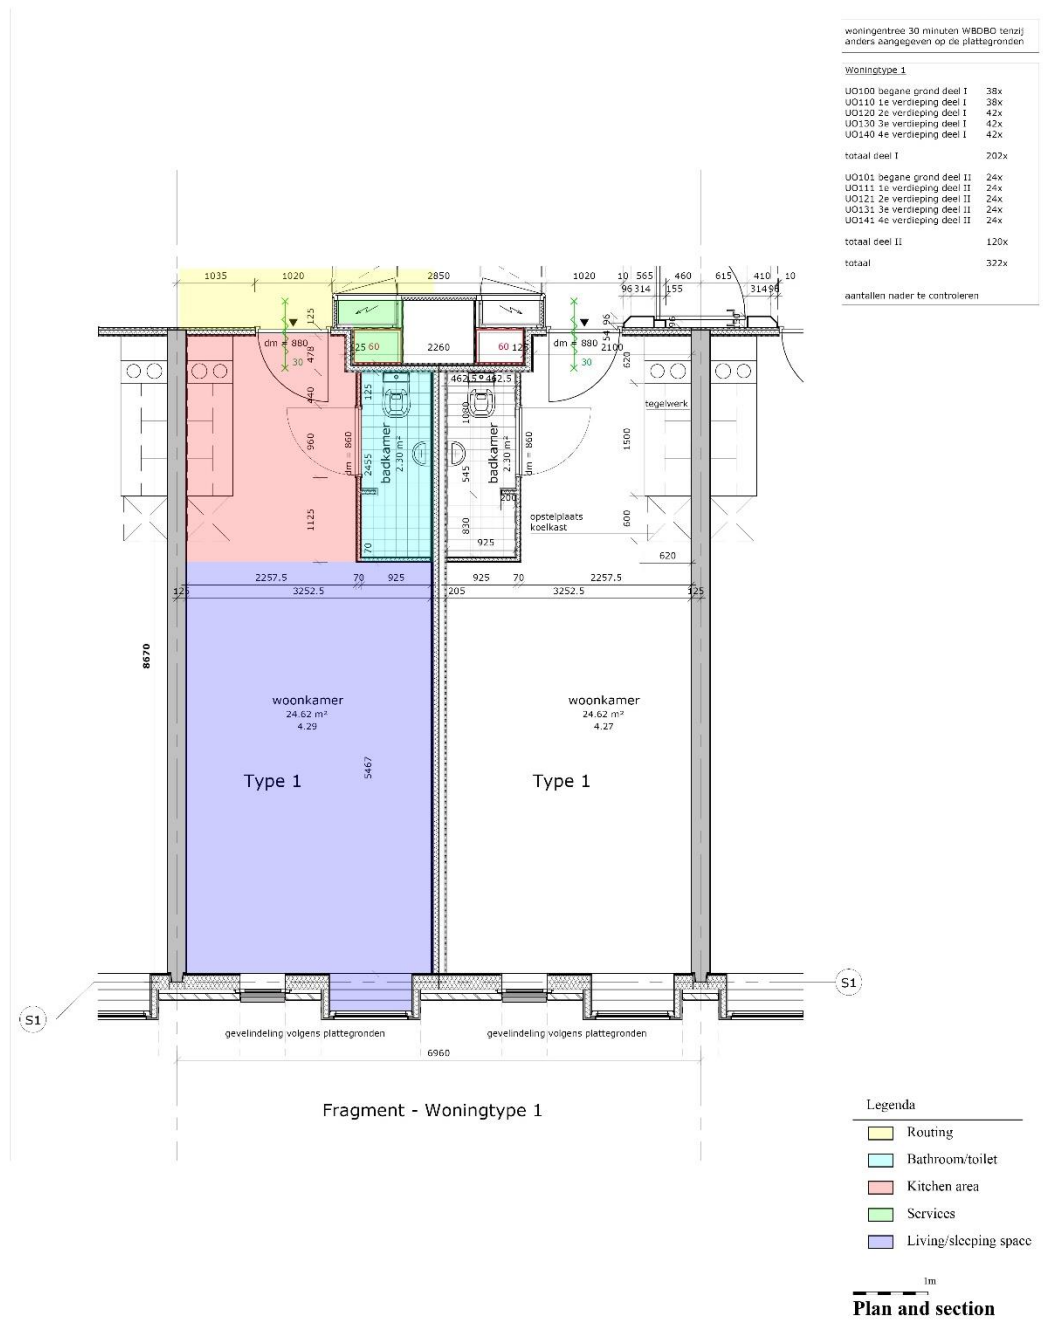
Röntgenweg case study analysis detailed dwellings plans (Studentenhuisvesting Spoorzone | Leeuwenkamp Architecten, n.d.)
